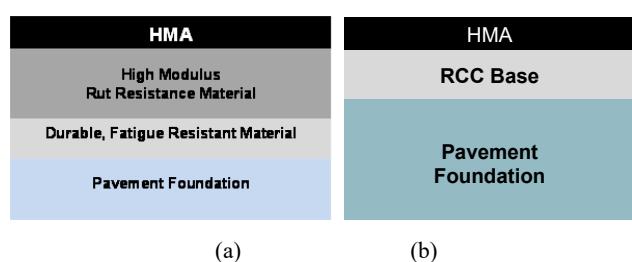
(a) Perpetual Pavement, (b) RCC-base Composite Pavement
